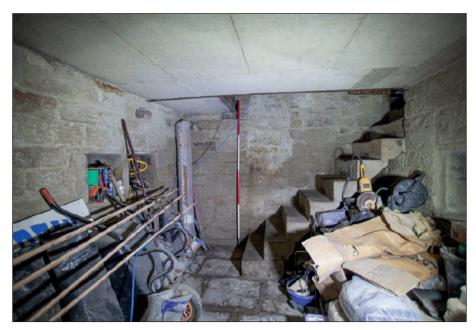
C2, blocked coal chute to the west wall and inserted staircase
